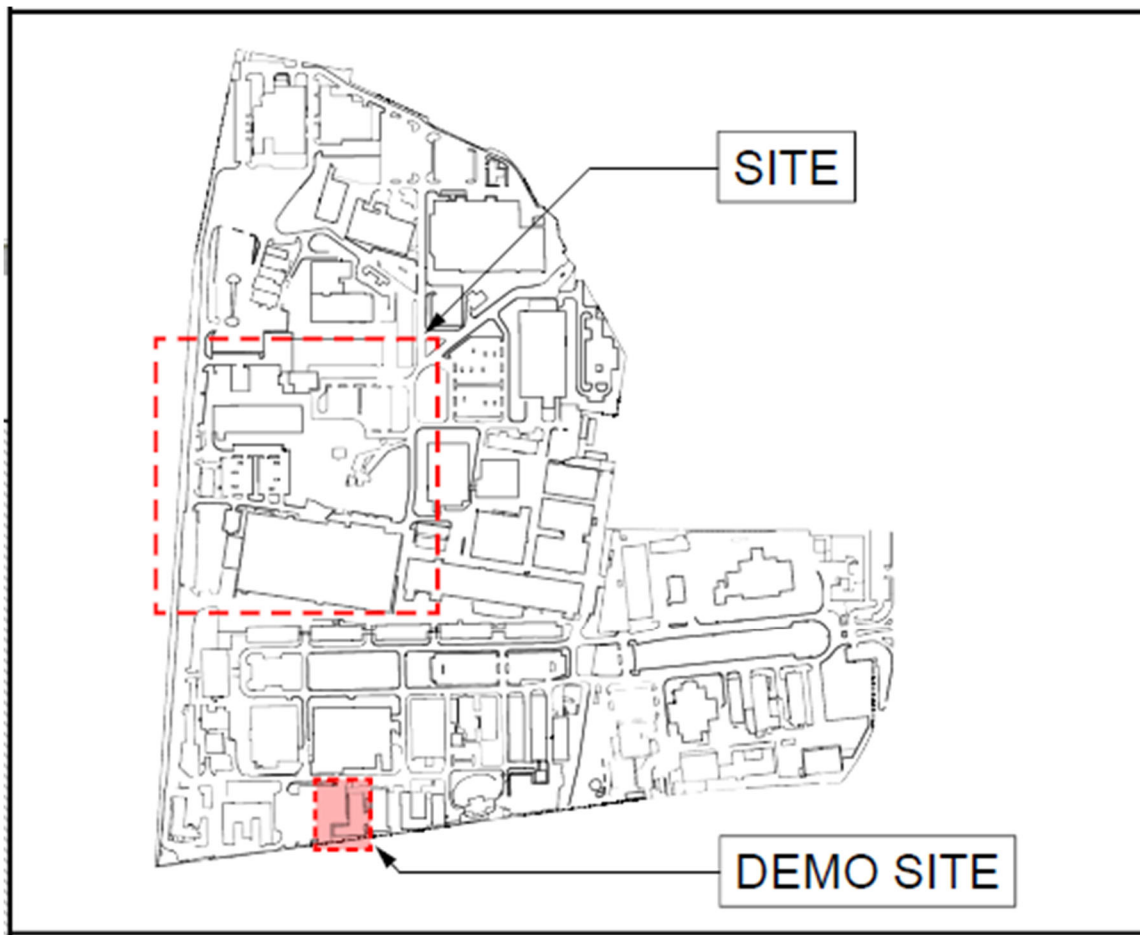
NRL Campus Location Map with New Building Project Site & Partial Building Demo Site
